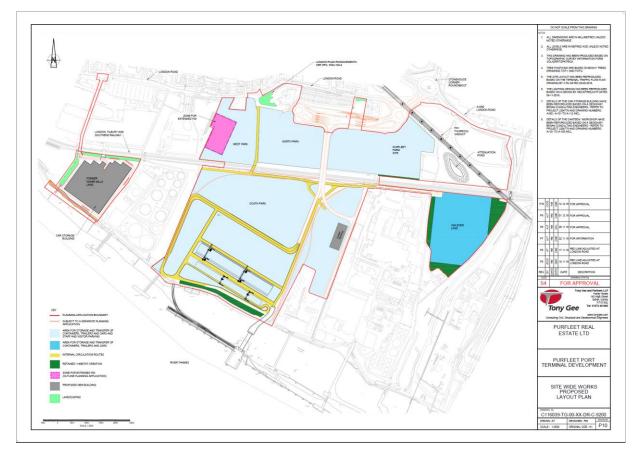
Purfleet Port Terminal Proposed Layout Plan
